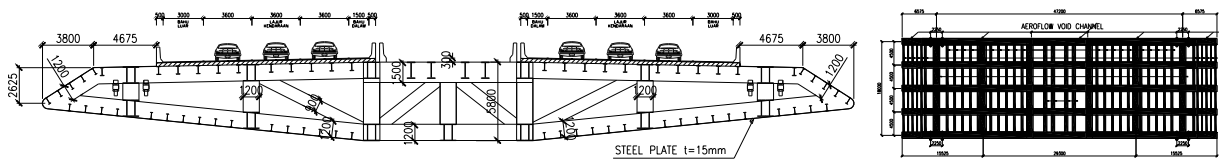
Shallow twin box girder of Sunda Strait Bridge
